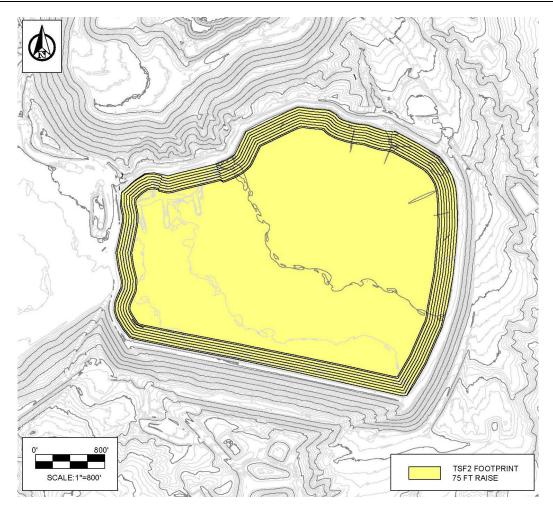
Tailings Storage Facility 2 Tailings-Disposal Location Using Existing Footprint
